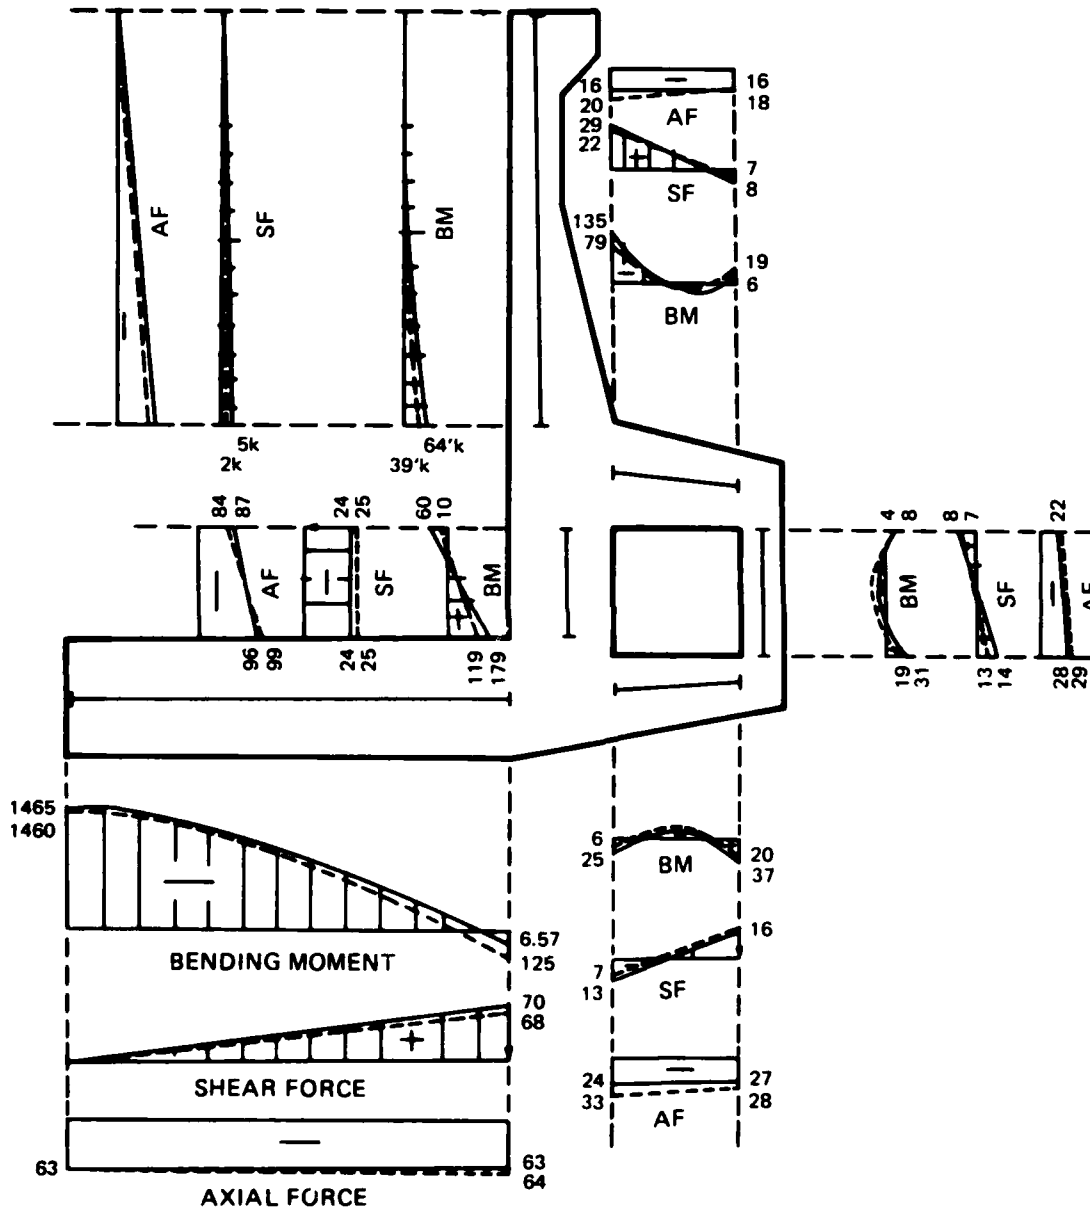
Case 1B--internal forces acting on construction with backfill condition
